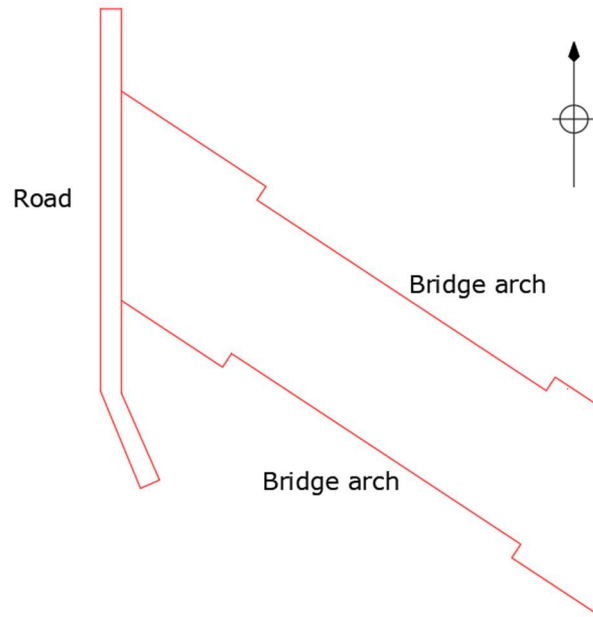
Sketch plan of the 19th century bridge arches (right) in relation to the current bridge (left).
